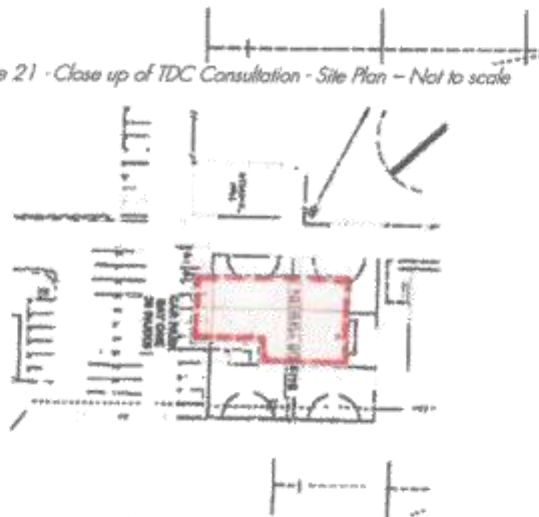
Same image to the scale it was likely to have been presented with the proposed buildings for demolition highlighted
